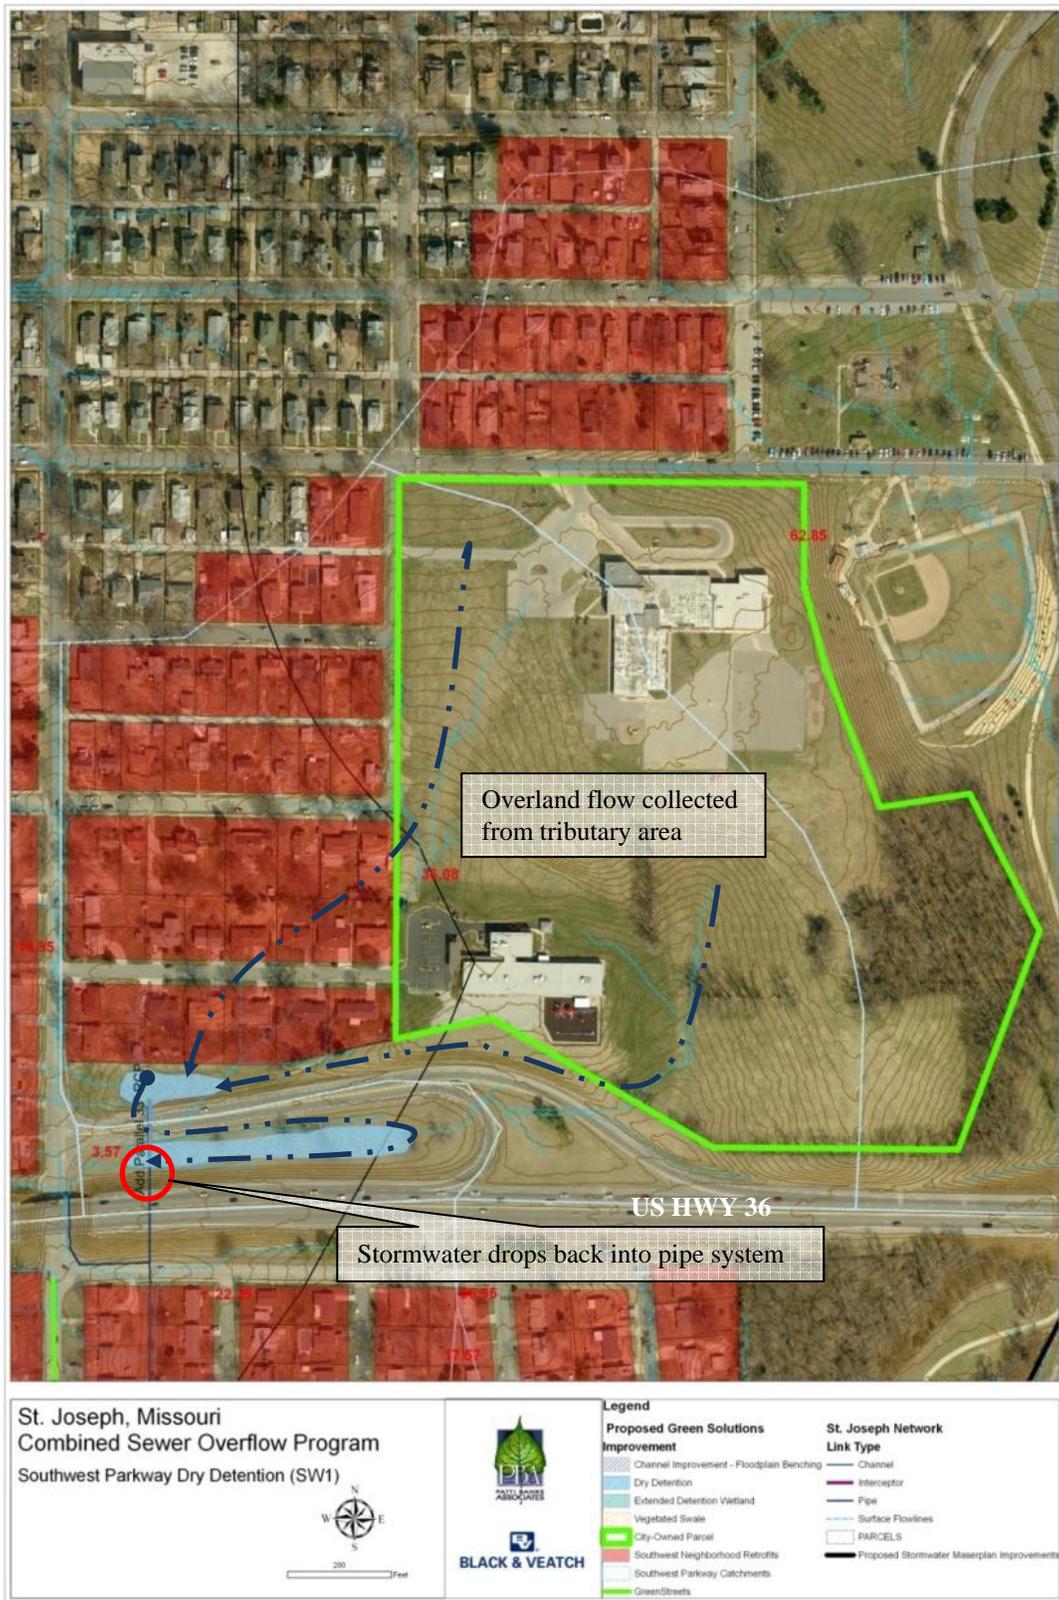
Southwest Parkway Extended Dry Detention Concept (SW1)
